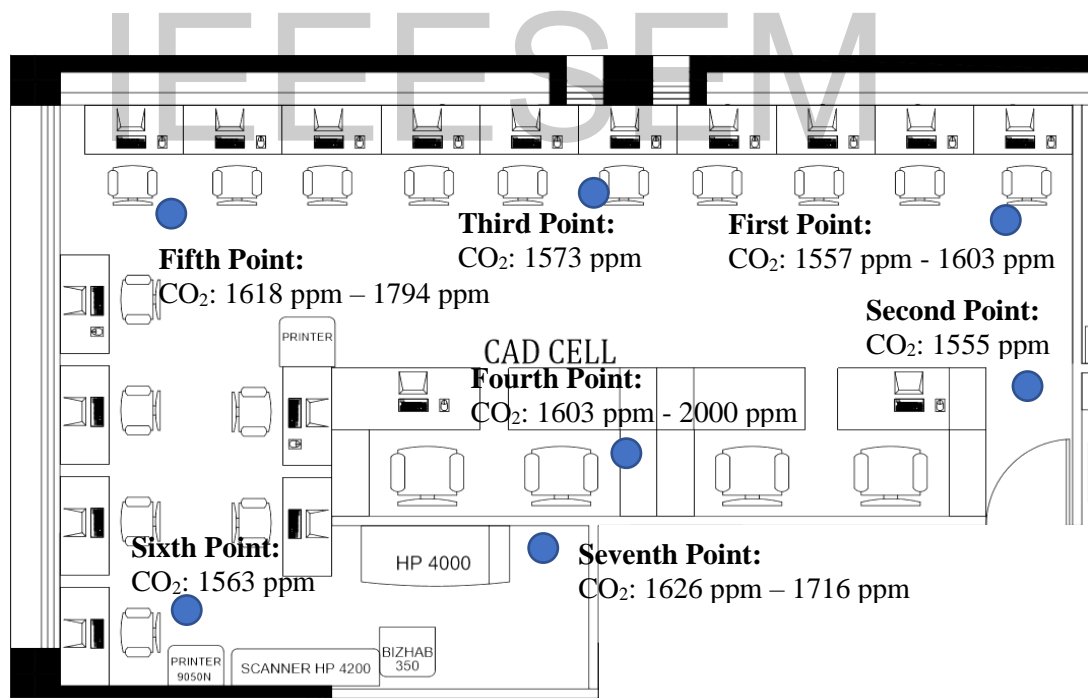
CAD Cell in the Third Floor Plan (SNGPL)
